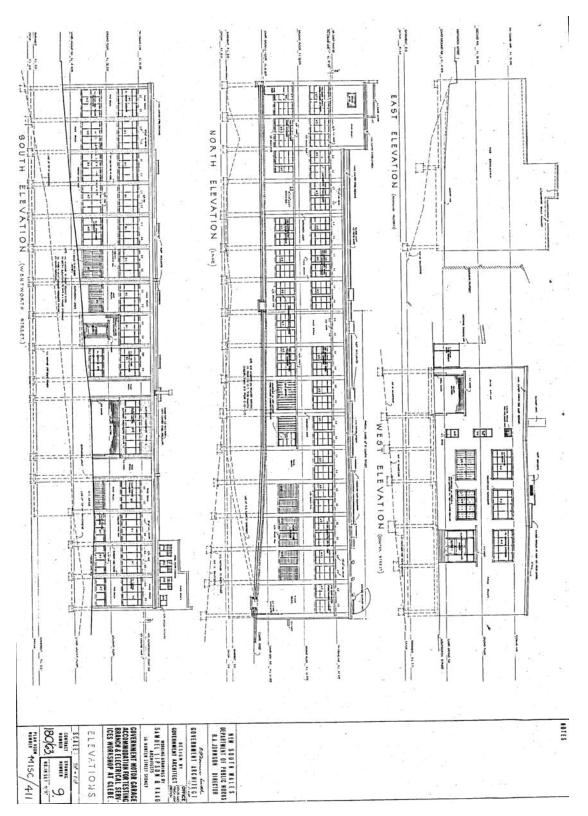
Elevations of the Testing and Inspection Branch building of the Public Works Department
